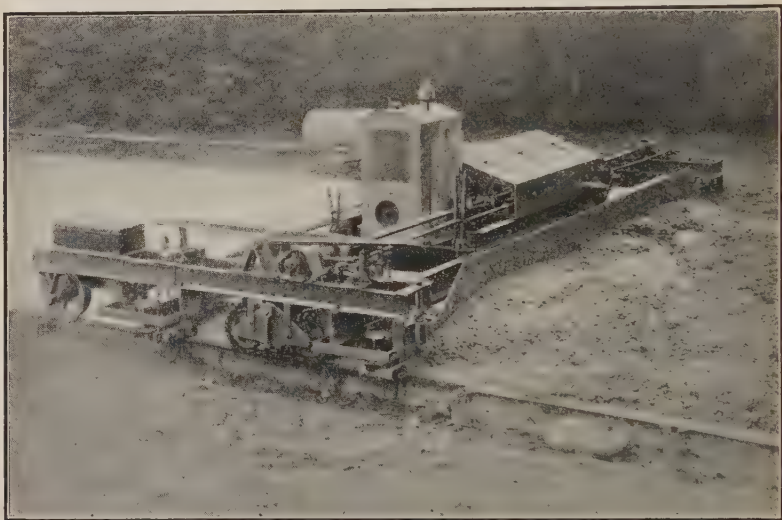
Screed type of finishing machine. There is no tamping bar on this machine.
